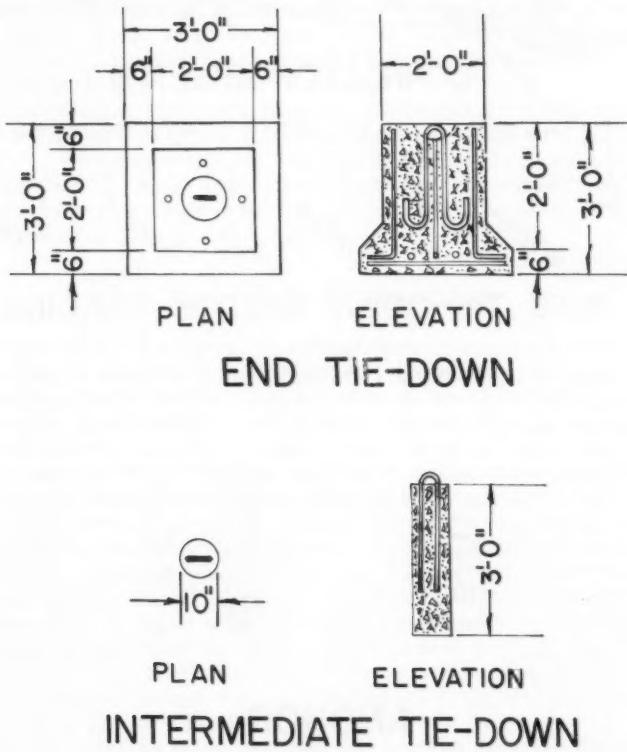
TIE-DOWN ANCHORS FOR USE WITH CABLES
